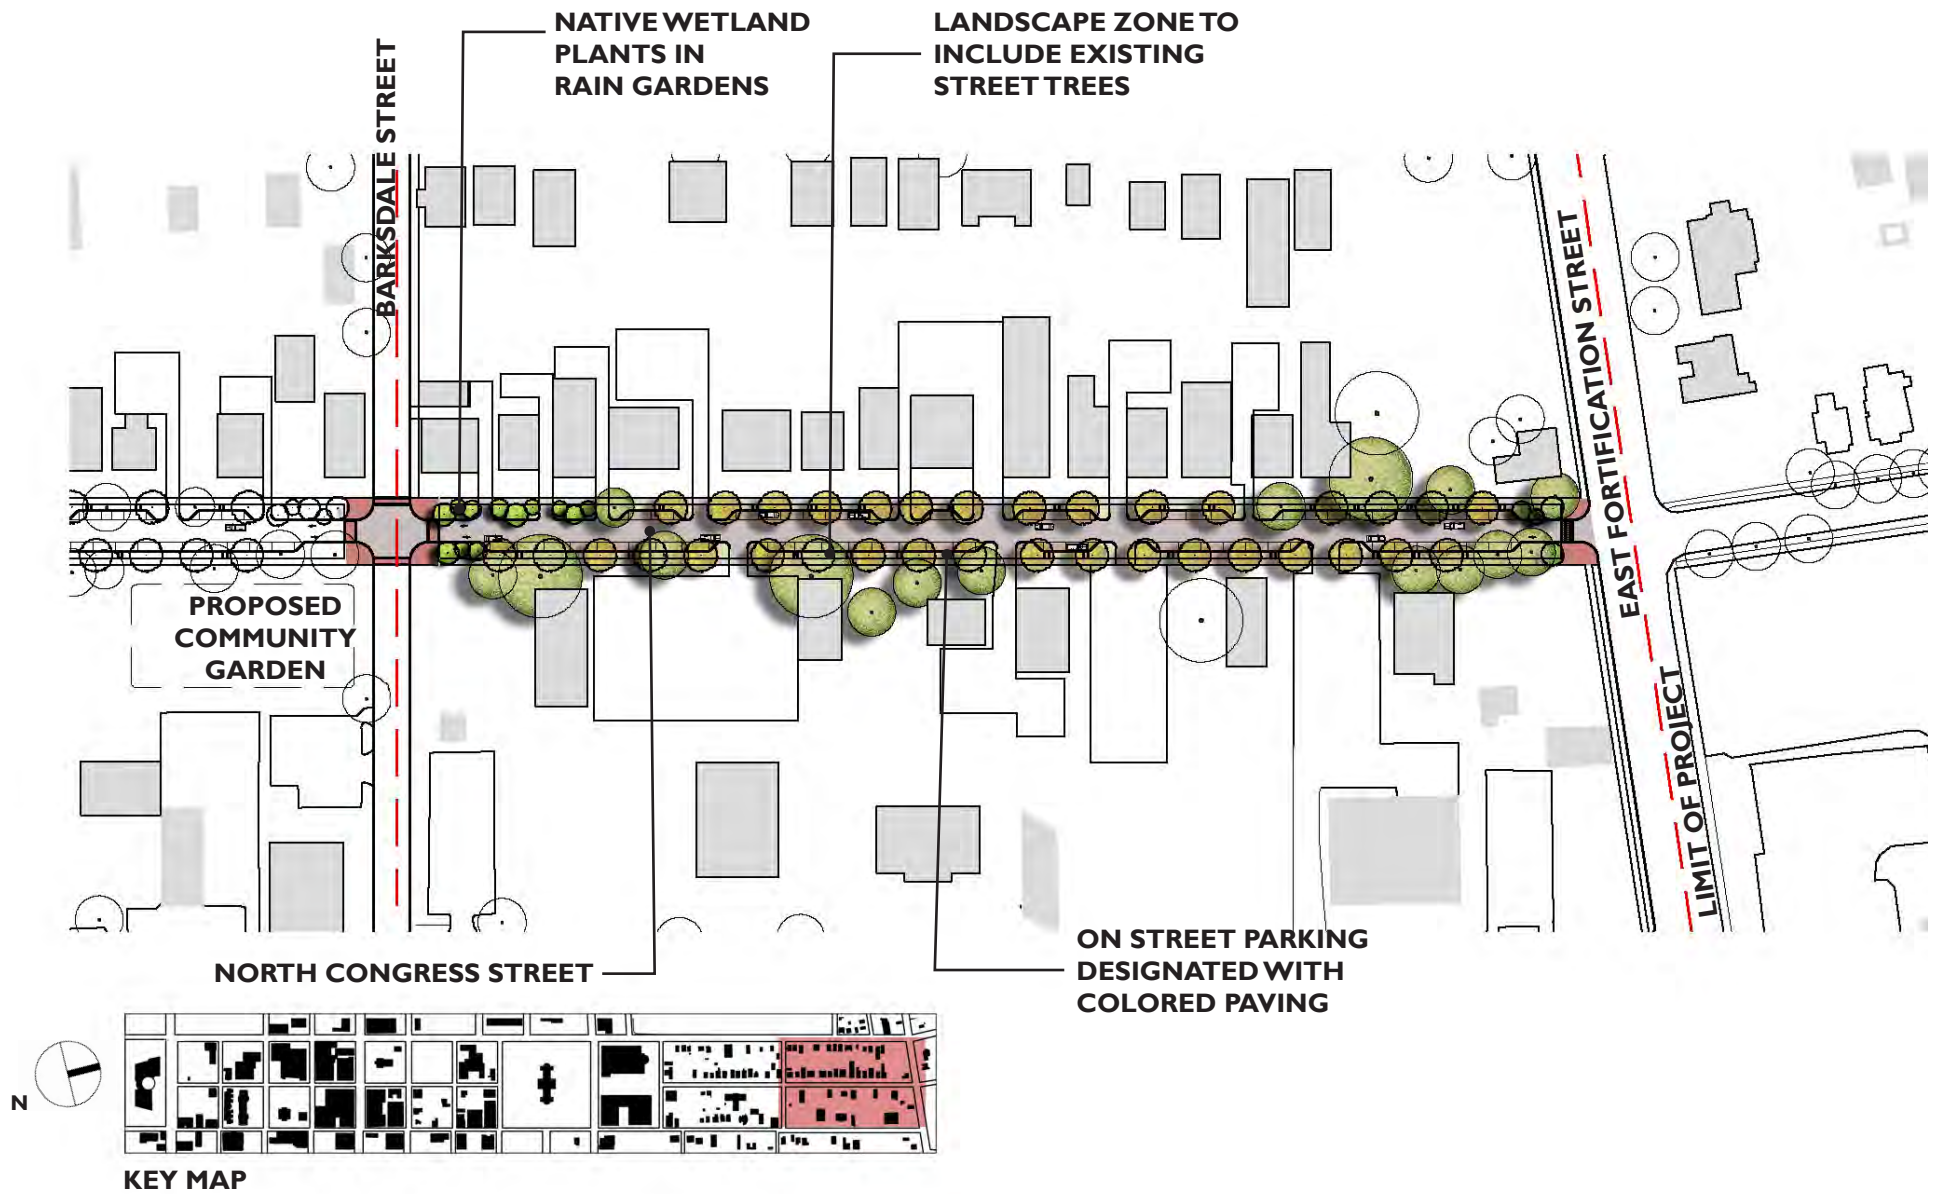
Conceptual layout for North Congress from Barksdale Street to East Fortification Street.
